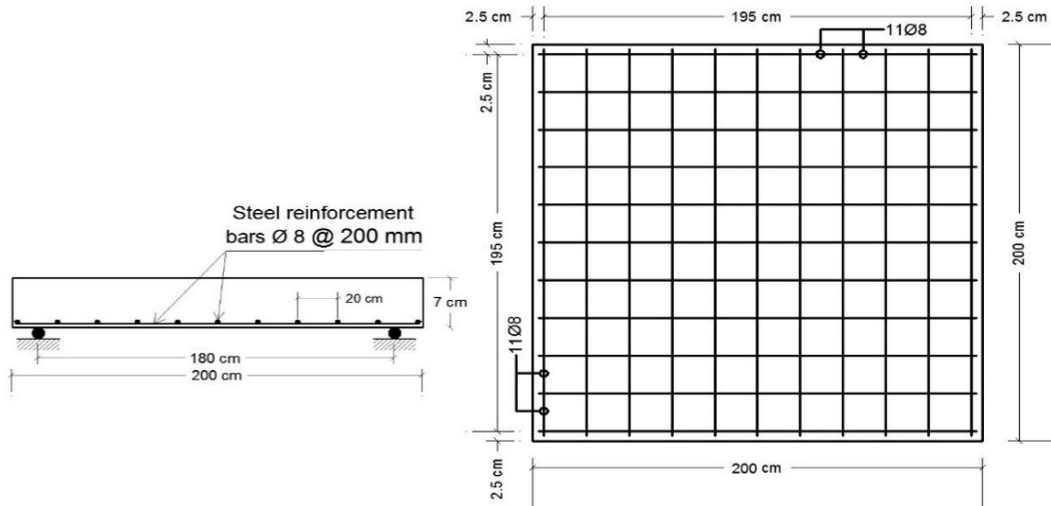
Dimensions and reinforcement details of the control specimen and the other specimens prior to strengthening.
